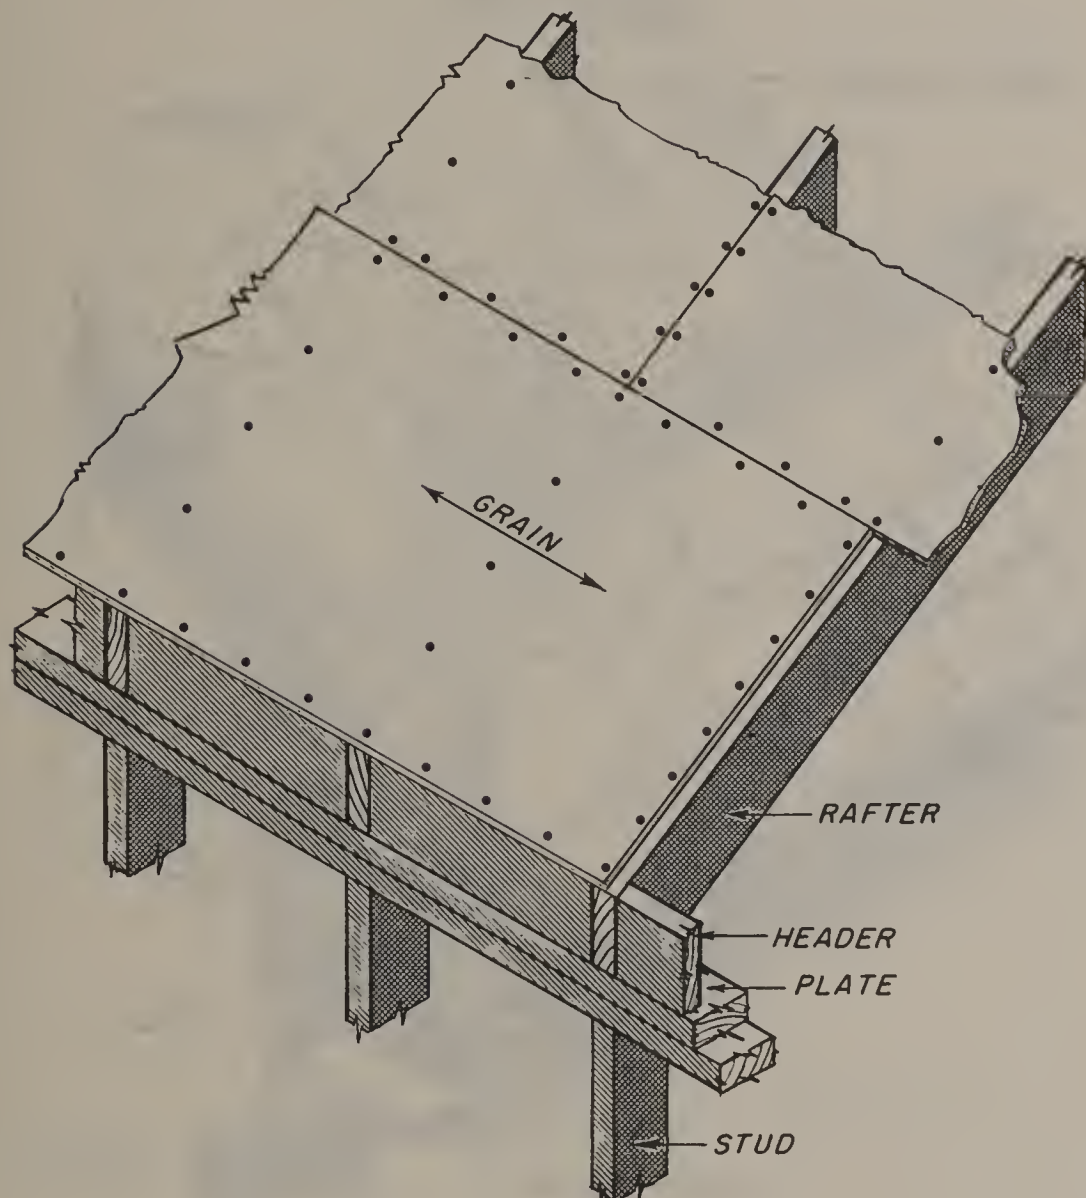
Plywood roof sheathing. Nailed around edges with eightpenny nails spaced 5 inches and to intermediate rafters with eightpenny nails spaced 10 inches. Headers should be cut in between rafters, and securely nailed thereto, to support edges of the plywood and to receive the specified edge nailing. To receive the nails at the horizontal joints between the sheets of plywood, nailing strips are placed between the rafters and nailed to them.
